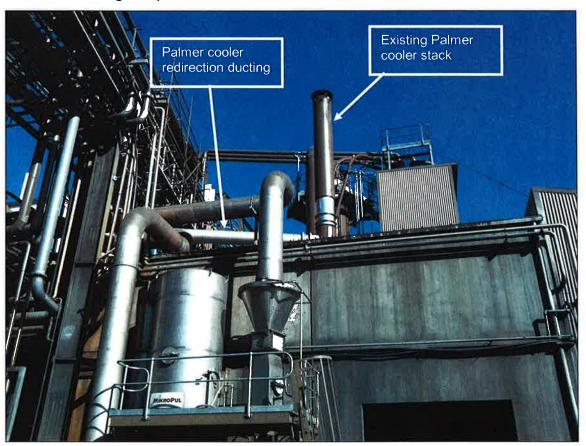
Photo showing ductwork from Palmer Cooler under construction
